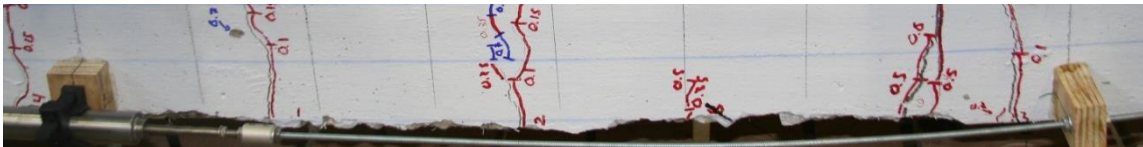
Damaged Corner of S7505BTM23 Where 4 Cracks Have Formed
